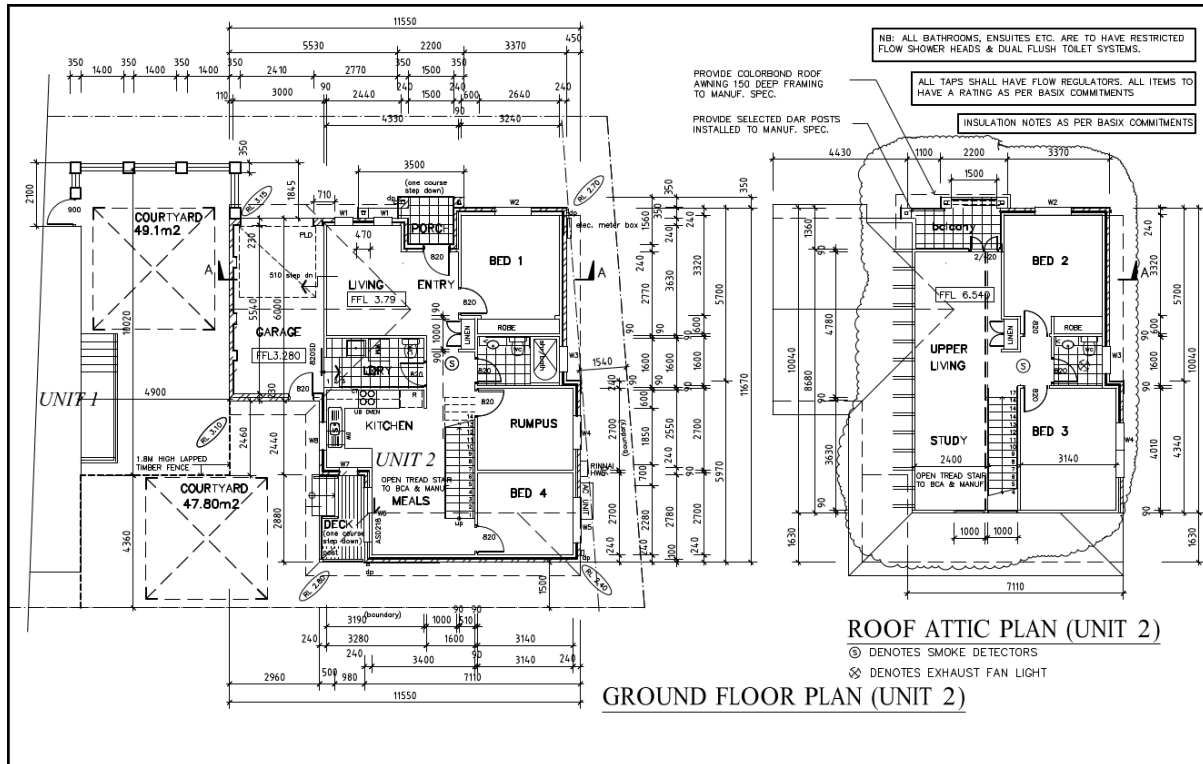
Approved Unit 2 floor plans - DA 2013/193/2
